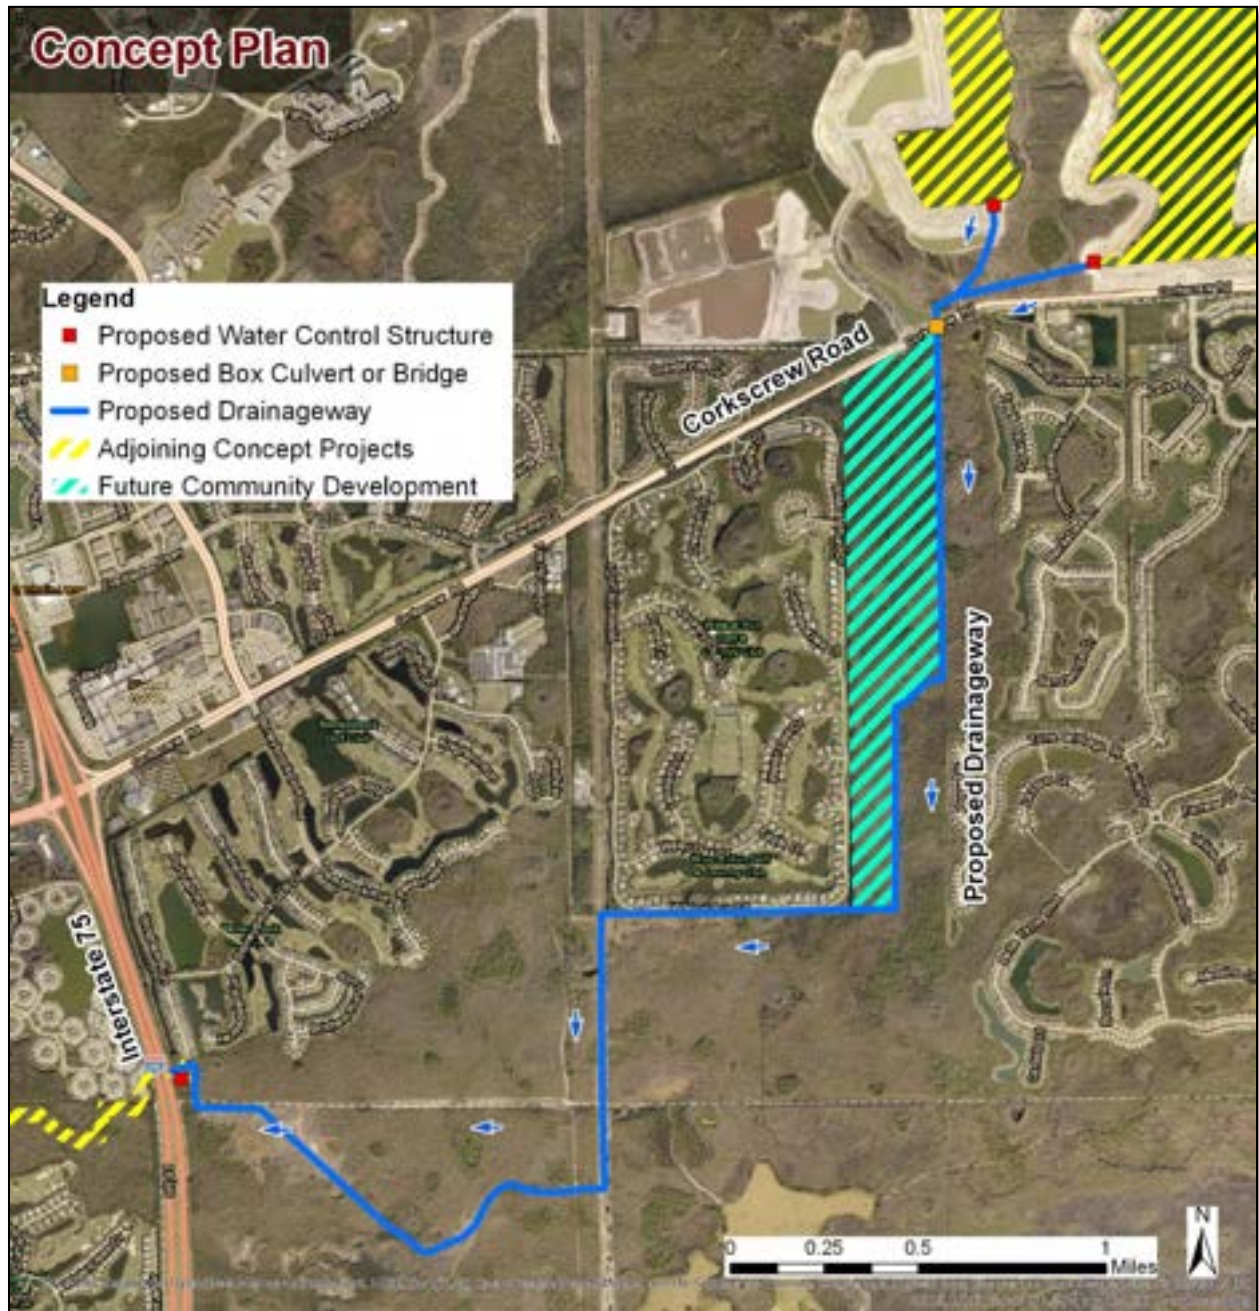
Concept Plan, 1.3.8 Alico Mine Lake to Halfway Creek Drainageway
